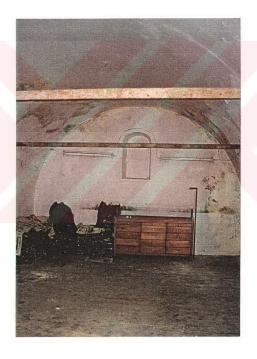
Vault and Tie bar of Space 13 (First Floor)
